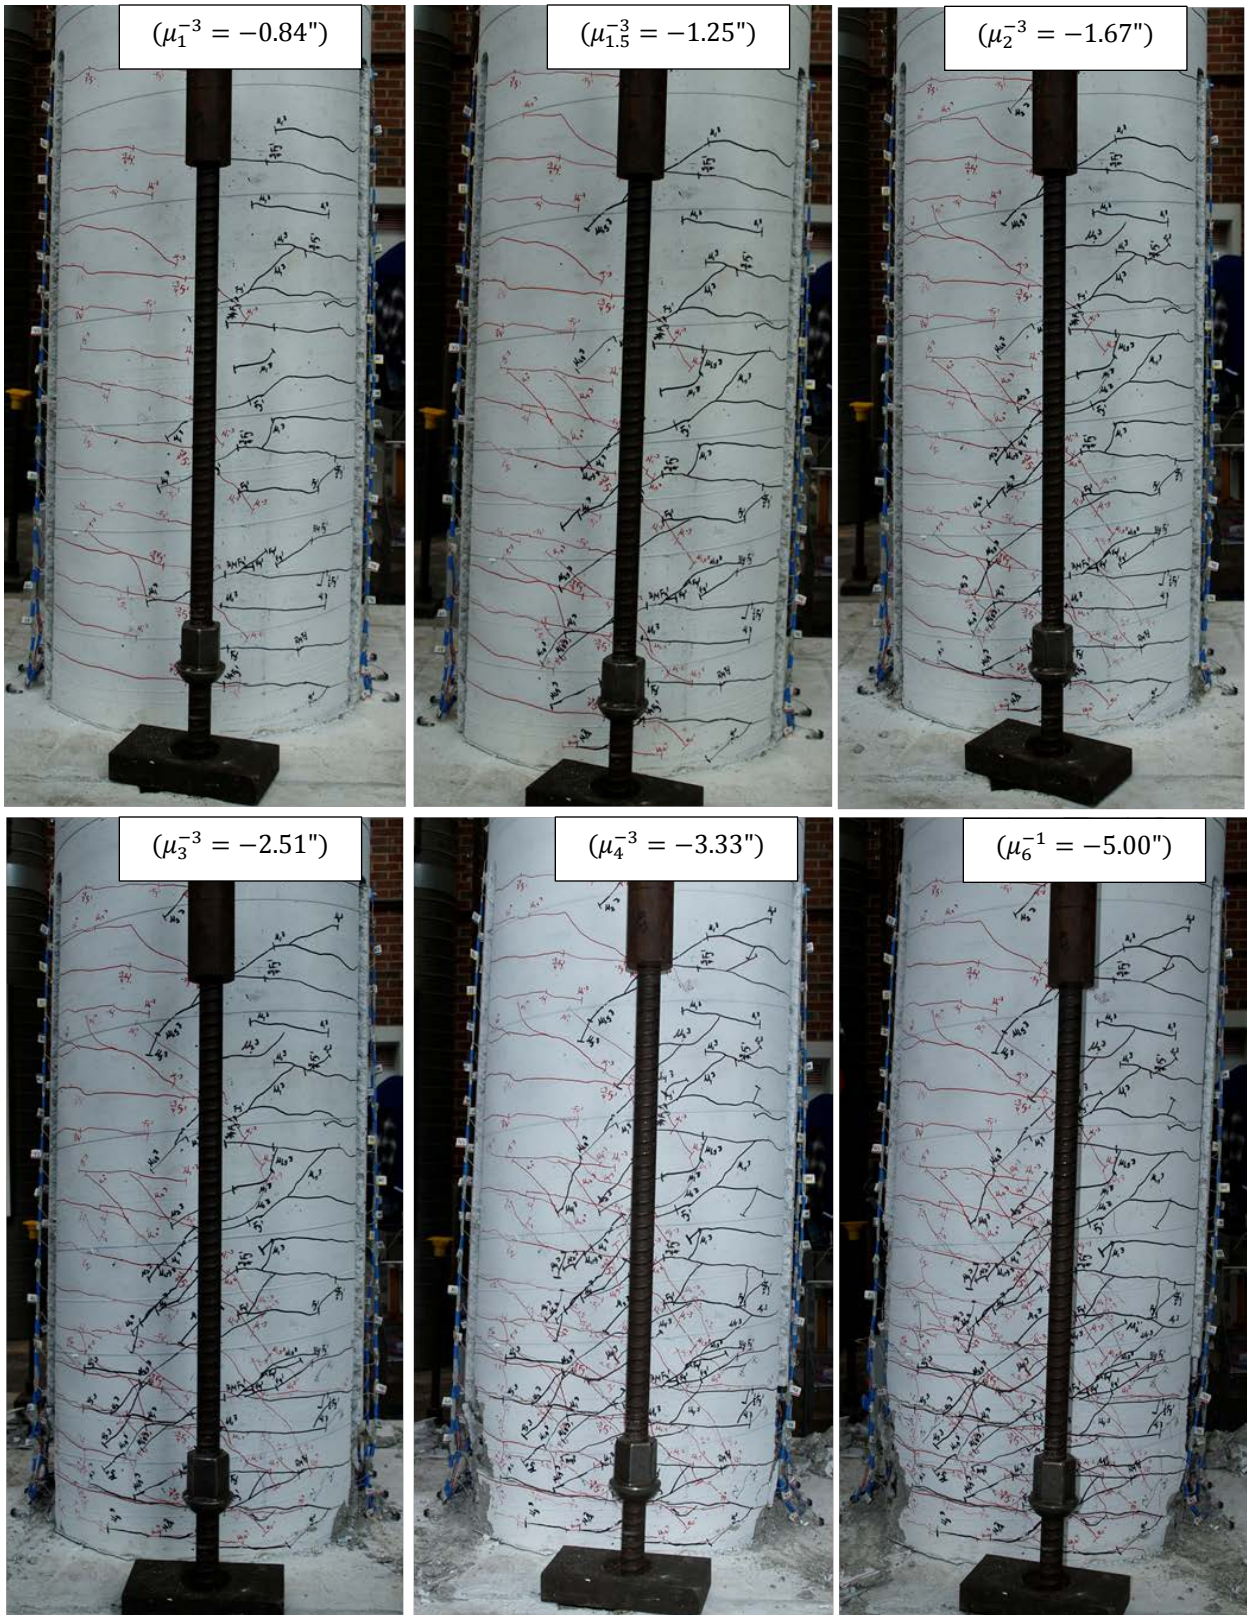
Test 15 – Crack Progression on the Back Side of the Specimen
